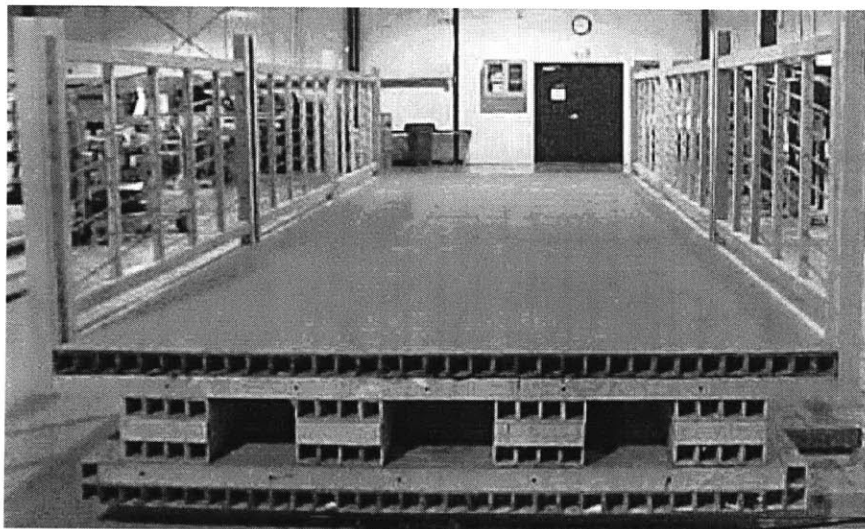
Cross-section of full-size bridge deck [14]
